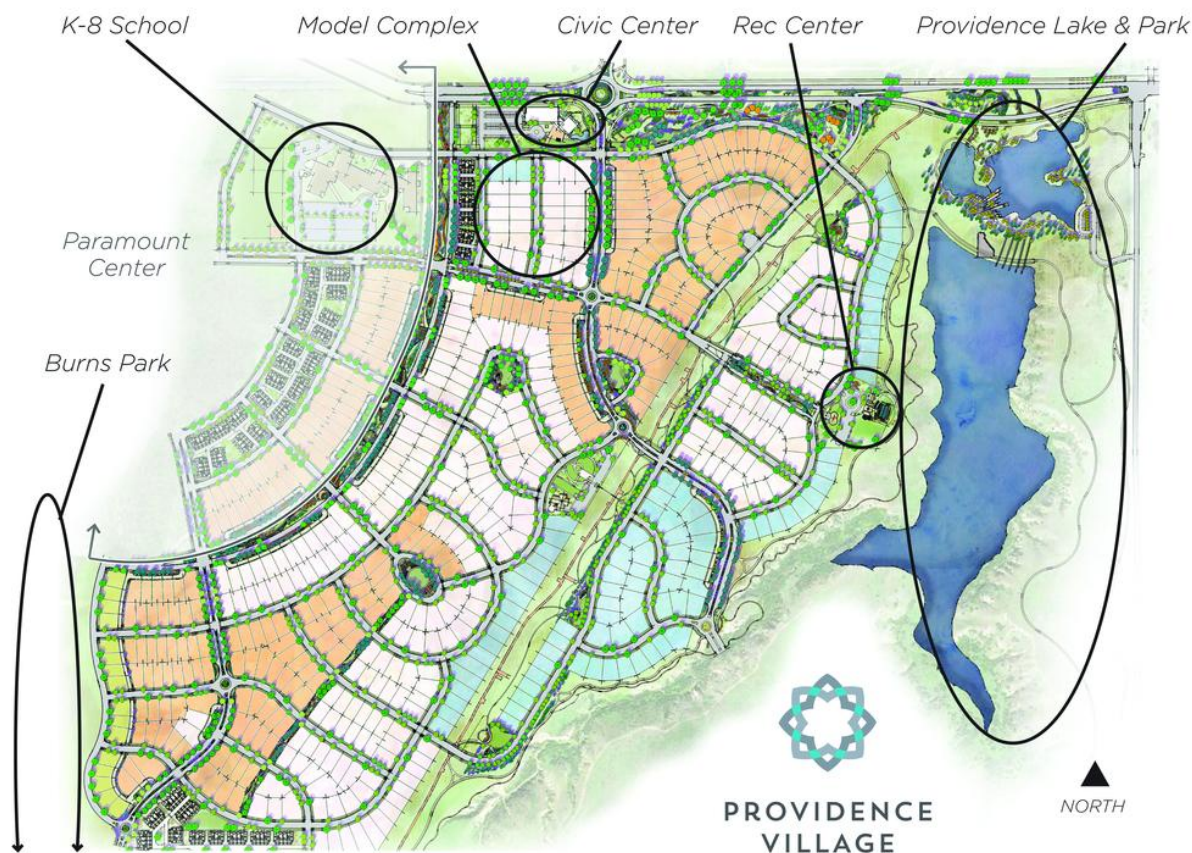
Providence Village at Sterling Ranch (Filing 1)
